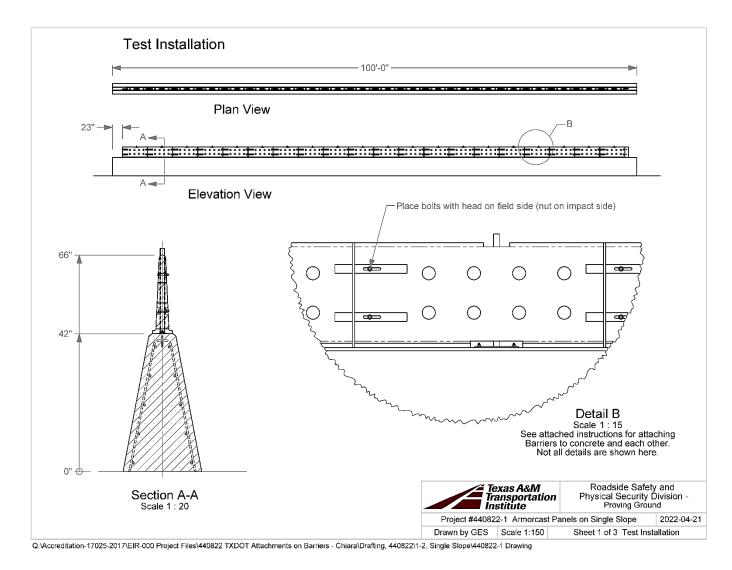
Details of Armorcast® Gawk Screen on Single-Slope Barrier.
